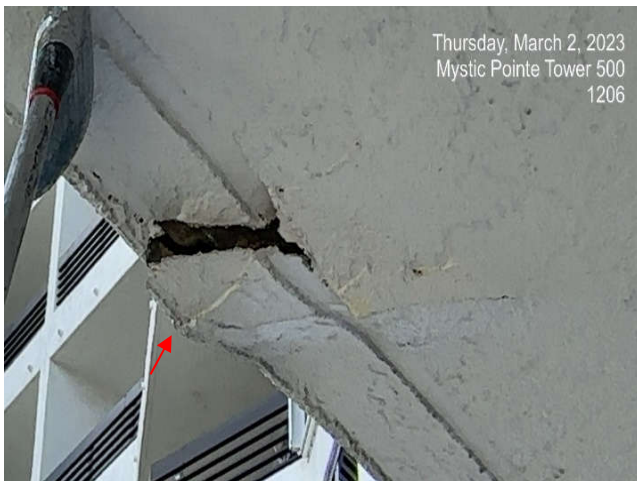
a.13 – Spalled concrete with exposed corroded rebar and initial stage of detachment at balcony ceiling (Unit 1206)
